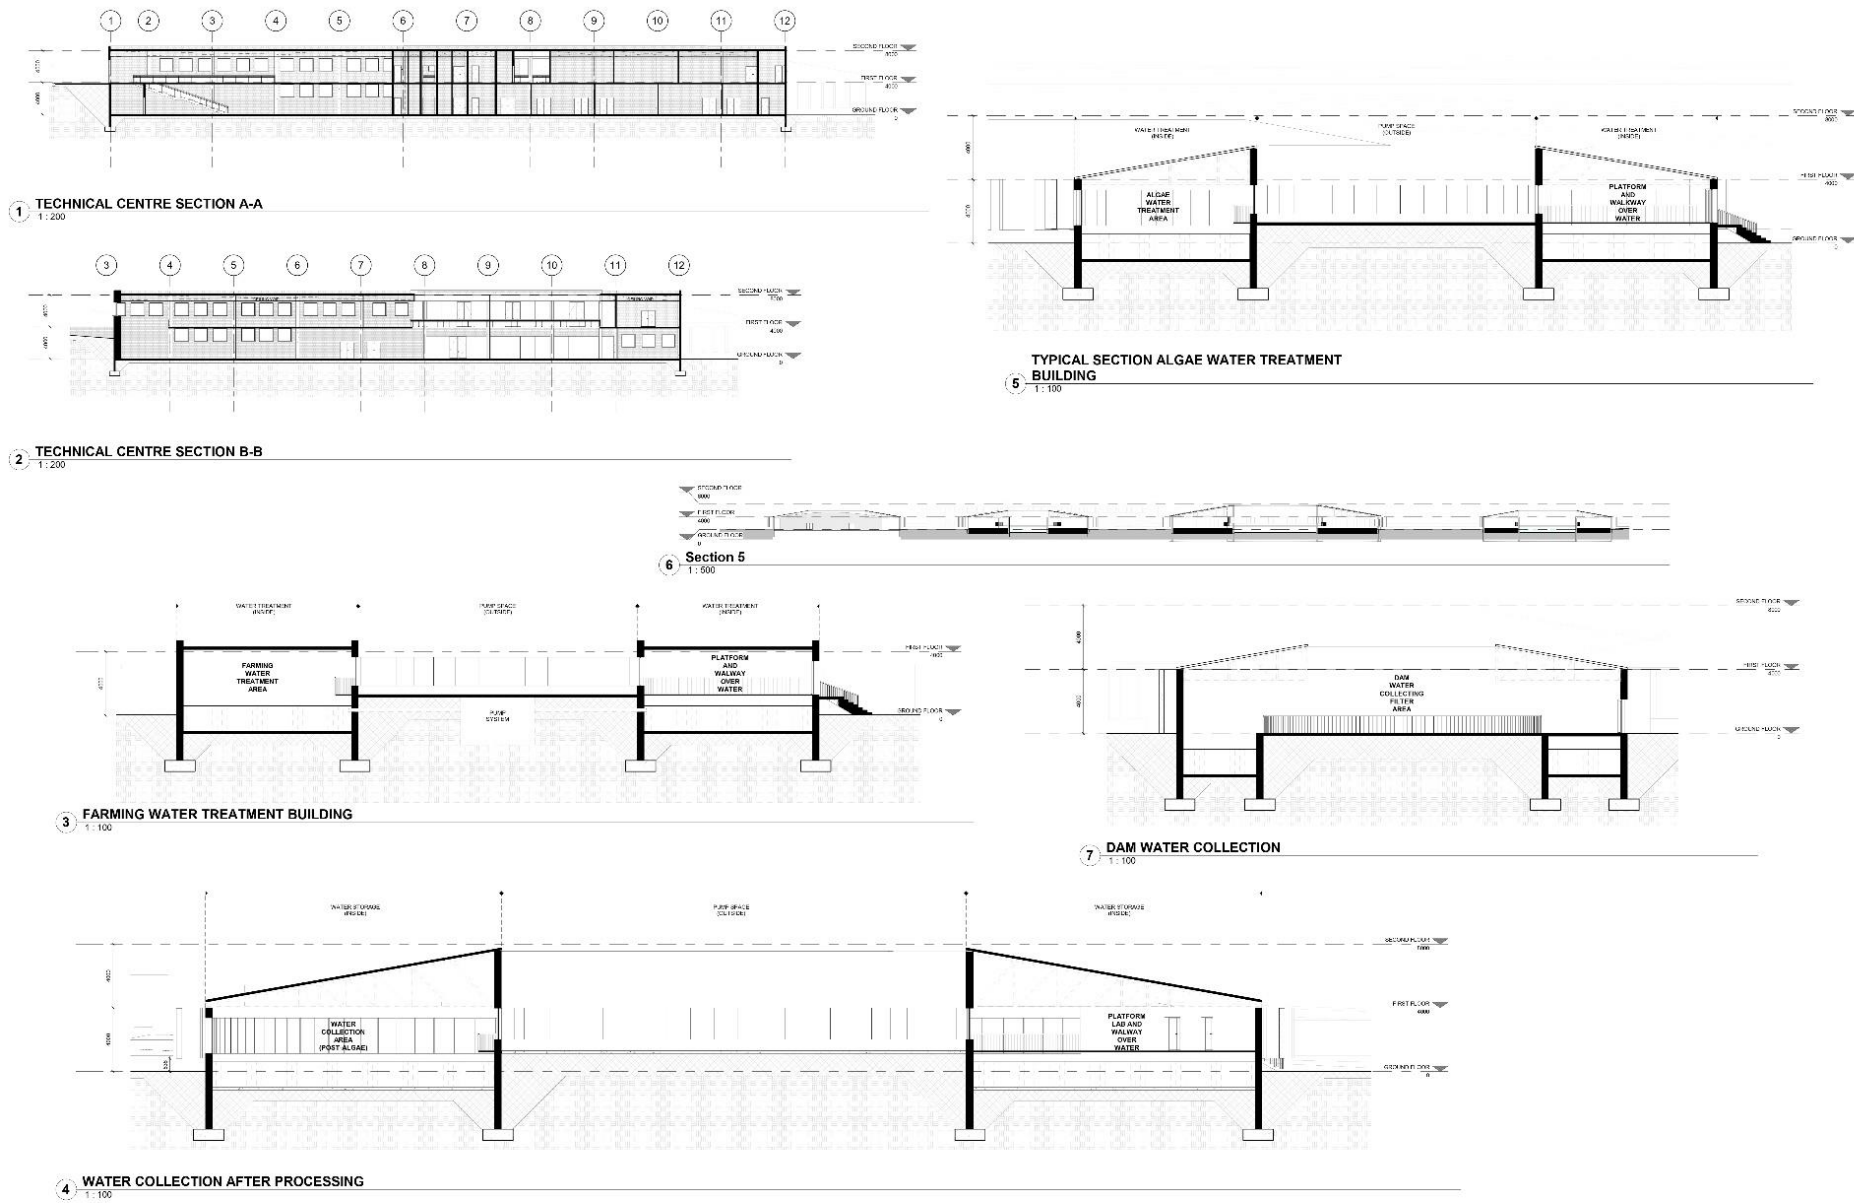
Revision 1 sections and elevations by Author at 1:1600.
